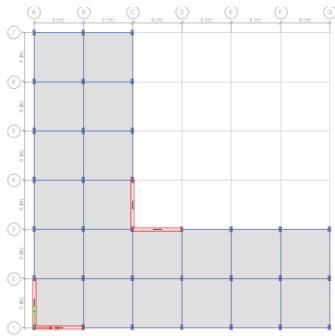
Plan of L shaped Building with shear wall having vertical opening
